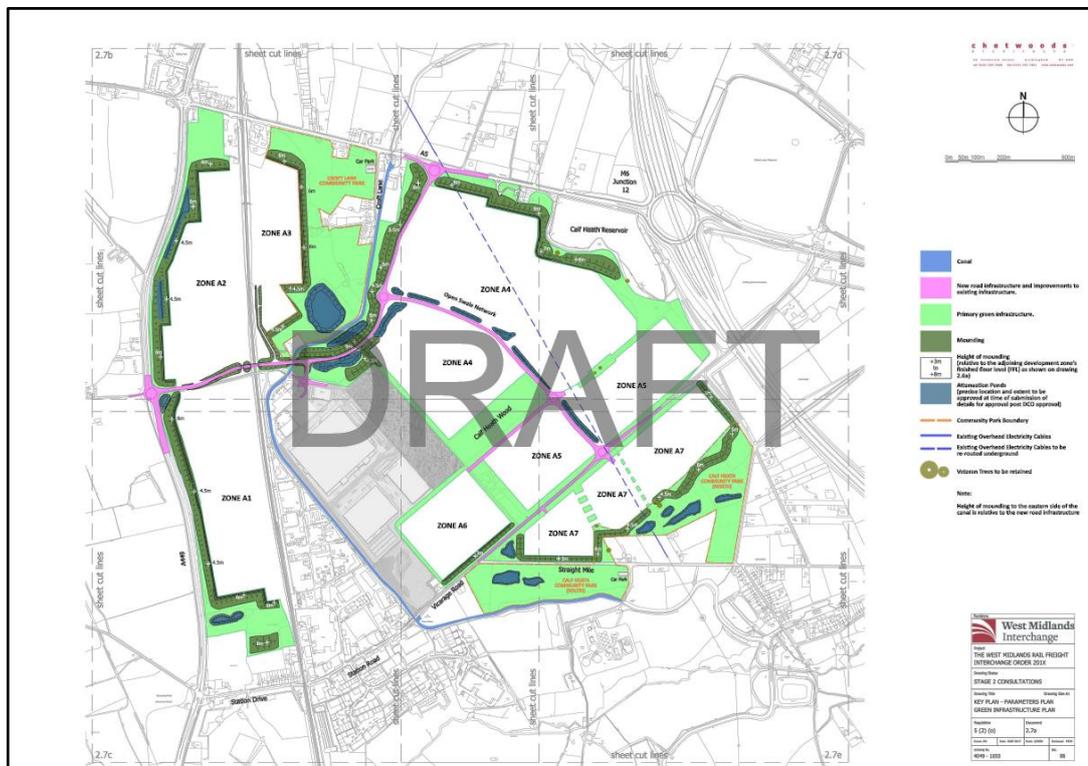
WMI Draft Green Infrastructure Parameter Plan
